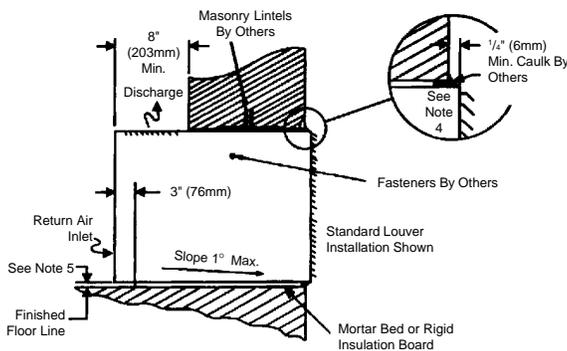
Panel construction, bottom inlet, stamped flanged louver
